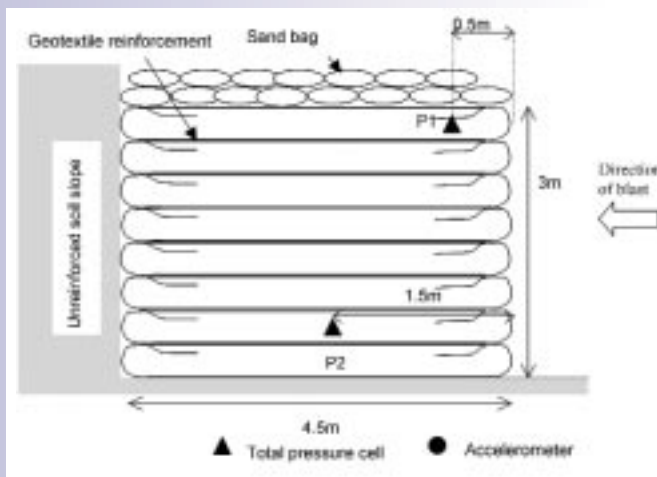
Side elevation of reinforced soil wall with instrument locations (not to scale)
